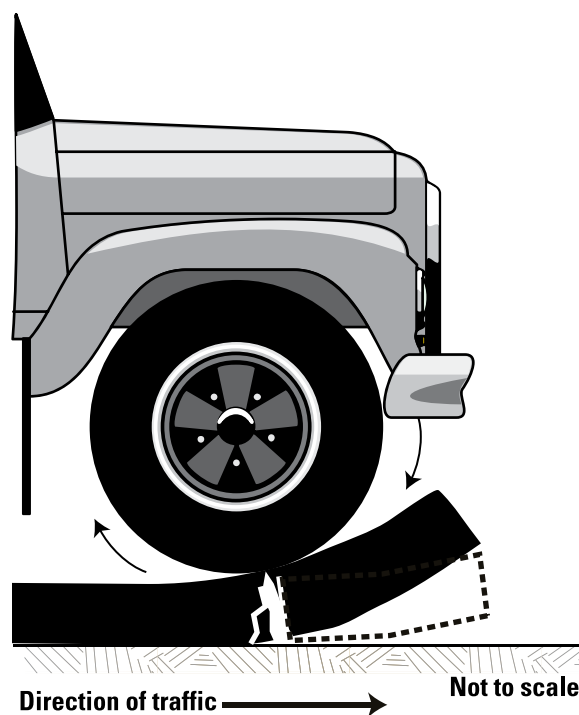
Exaggerated illustration of pavement curling. The edge of the slab at a joint or a free end lifts off the base, creating a cantilevered section of concrete that can break off under heavy wheel loading. (PCA)
